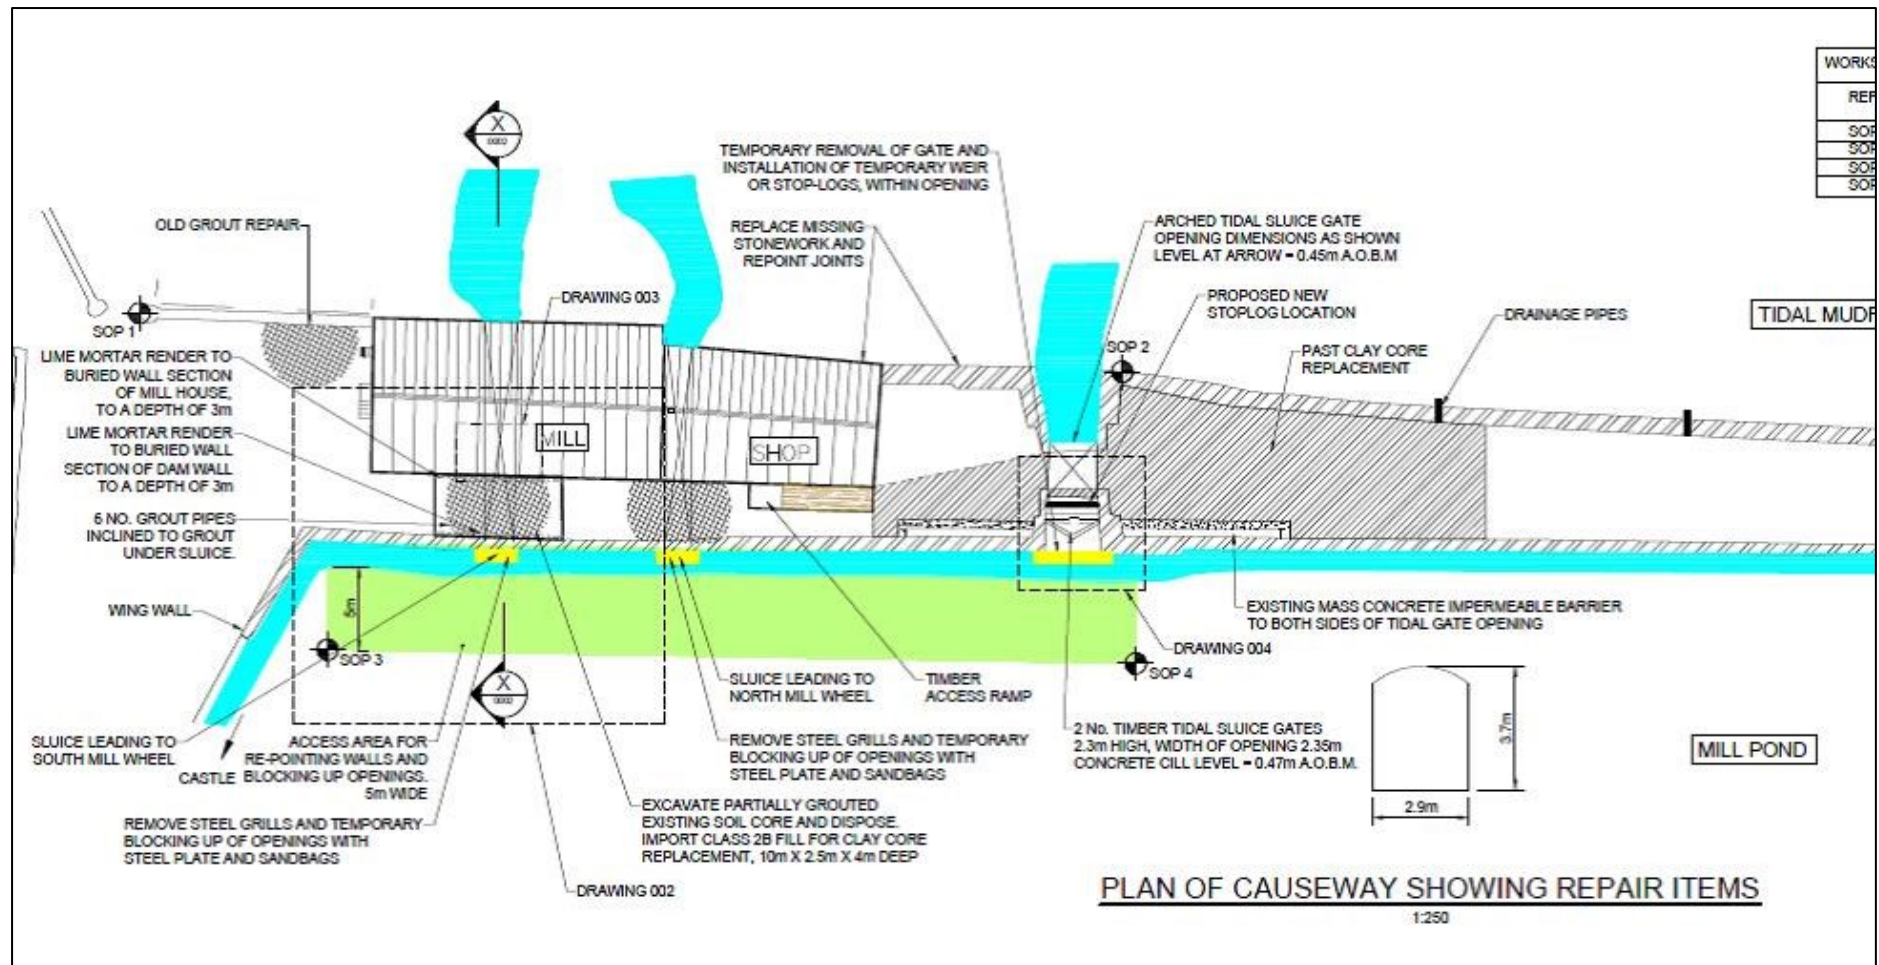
Plan of Carew French Mill (PRN 60057; Listed Building 6038) and its causeway showing the proposed scheme of repair works. (Reproduced courtesy of Atkins © Atkins Limited (2017))
